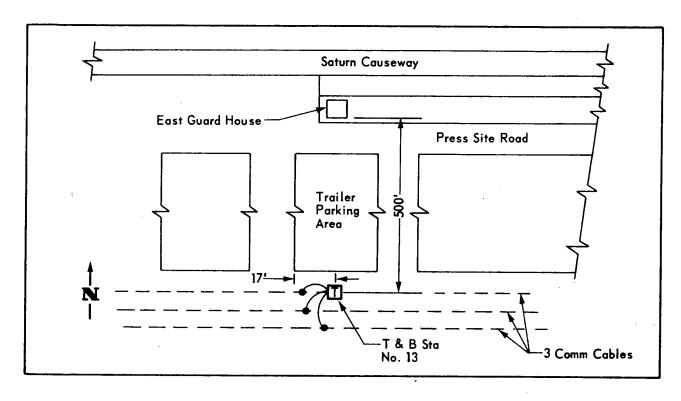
Test and Bond Station No. 13 Equipment Locator
